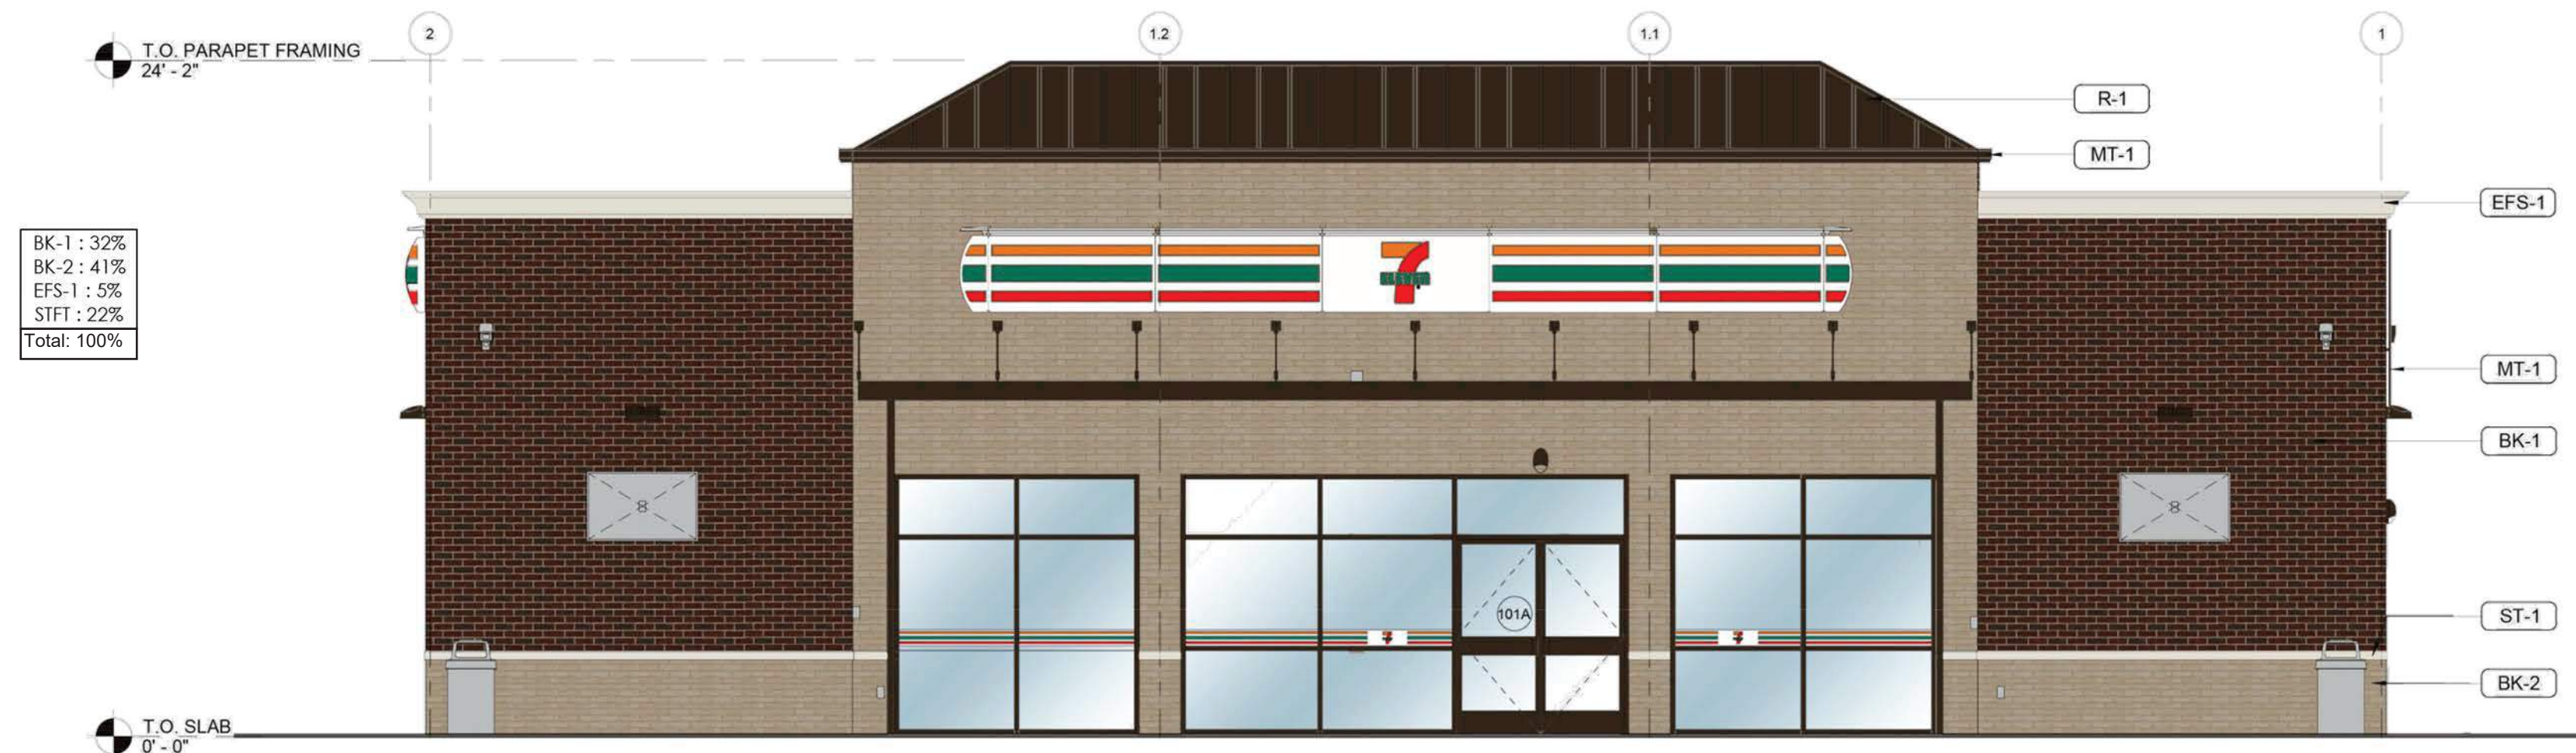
EXHIBIT F - APPROVED 7-Eleven SITE PLAN
